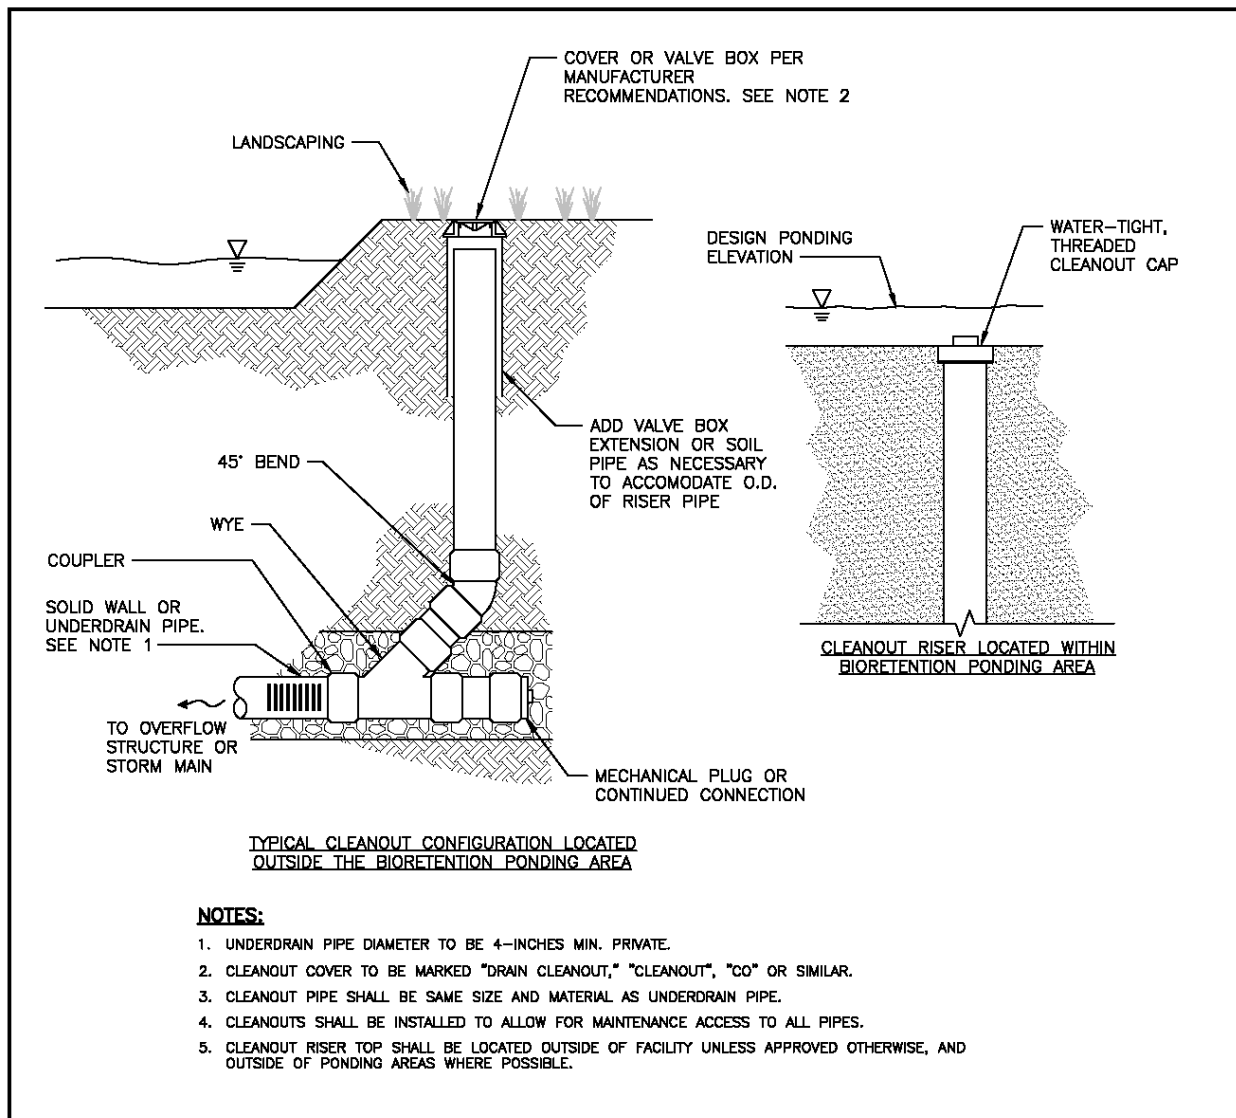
Stormwater Facility Cleanout for Facility Outside of the Right-of-way.
